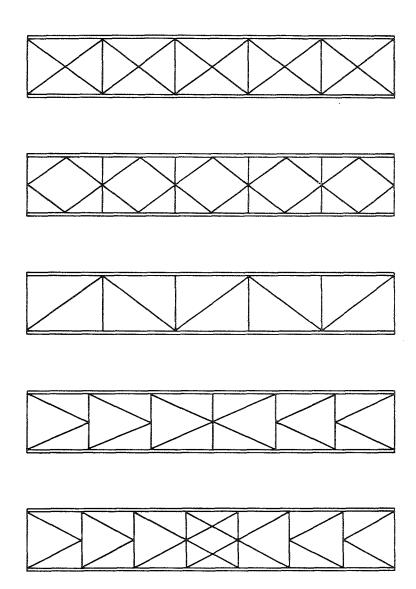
Typical Configurations of Top and Bottom Lateral Bracing
